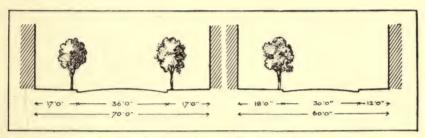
STREET PLANTED WITH DOUBLE FIG. 86.—STREET PLANTED WITH SINGLE ROW OF TREES ON SUNNY SIDE
